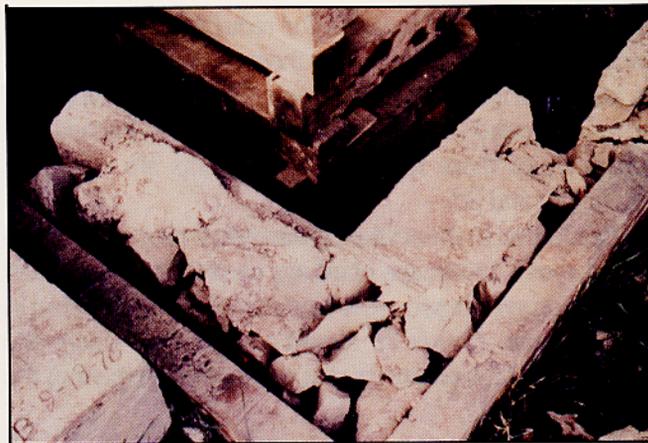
Structure Damage Deteriorated Foundation
